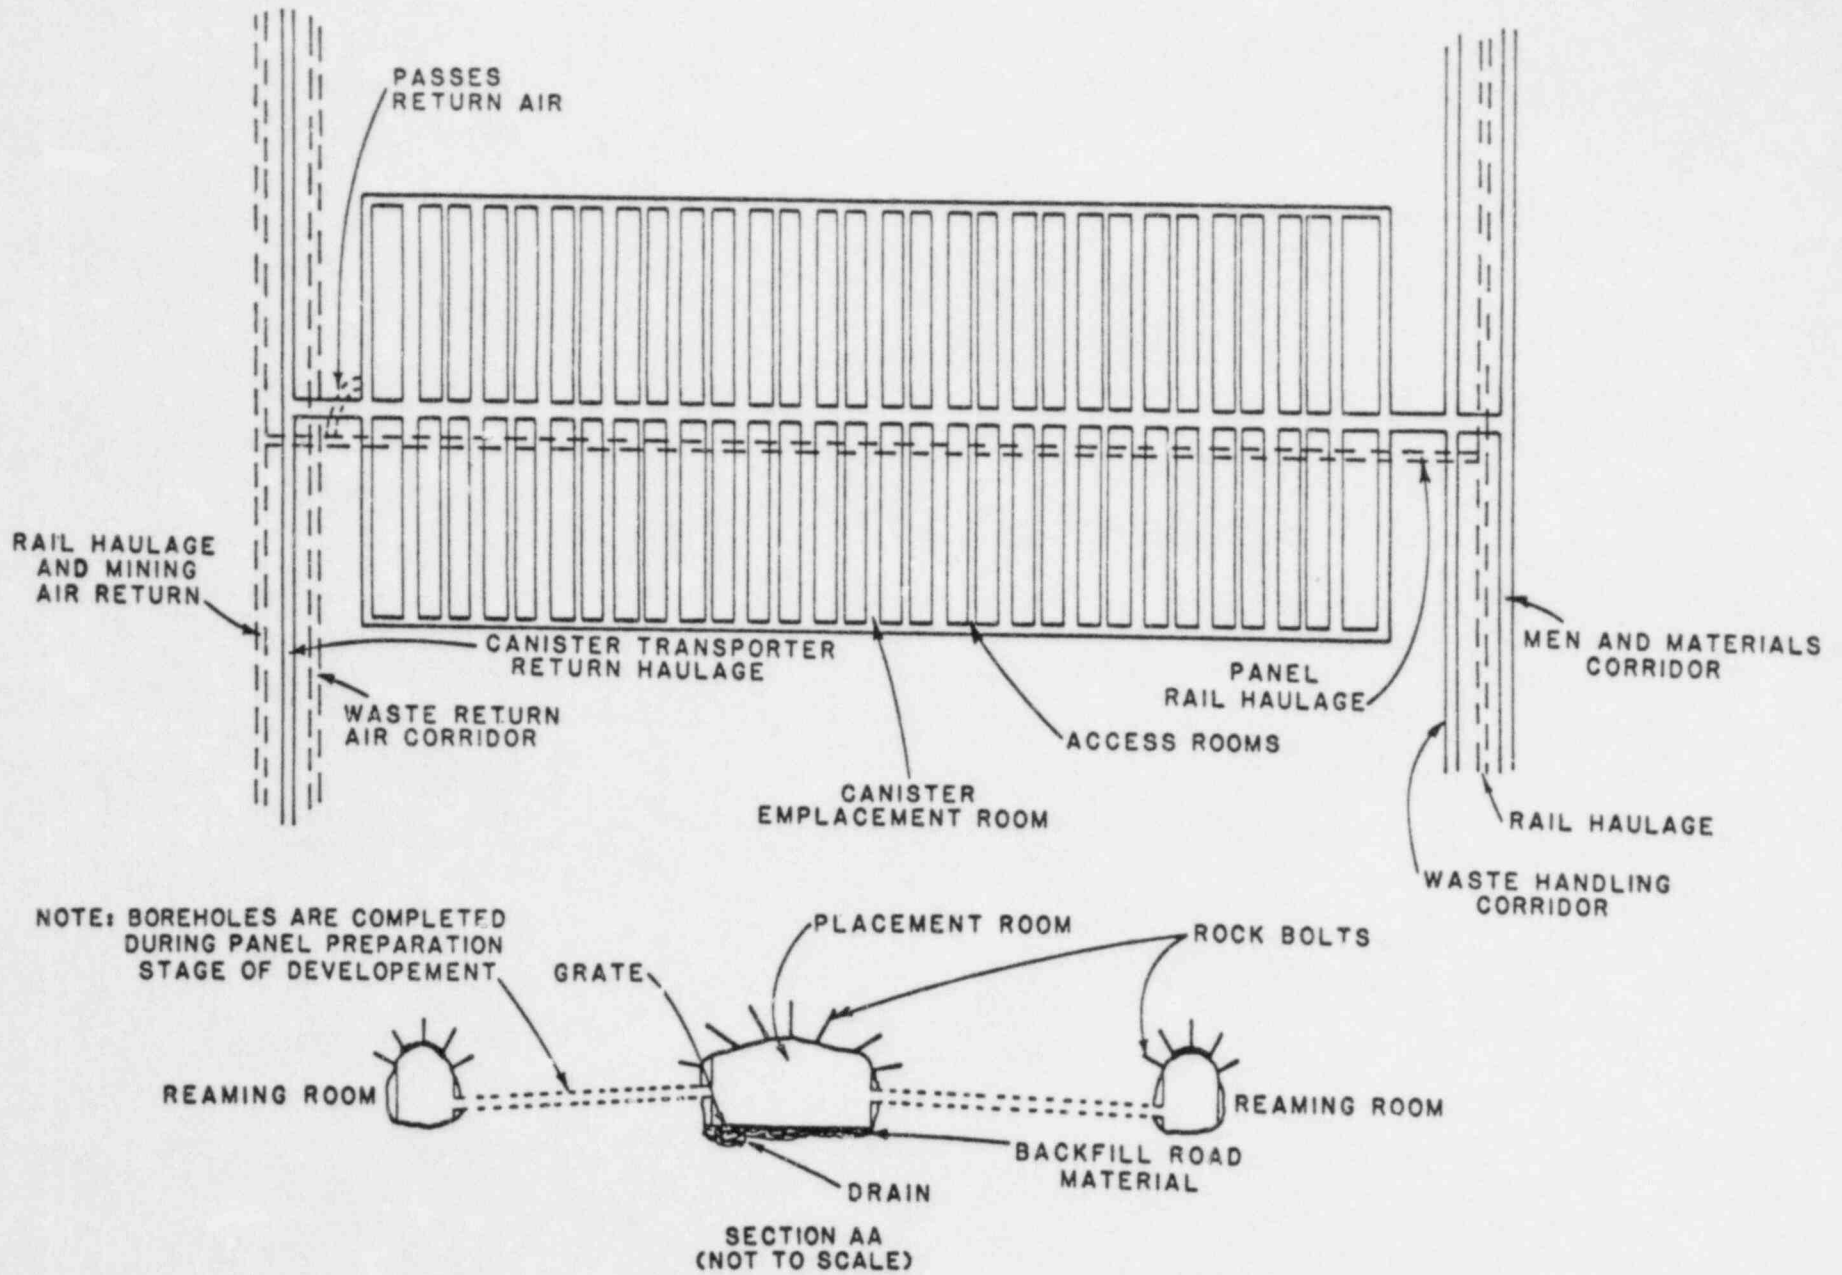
Panel and room layout for storage in horizontal holes. (RHO-BWI-CD-35)
